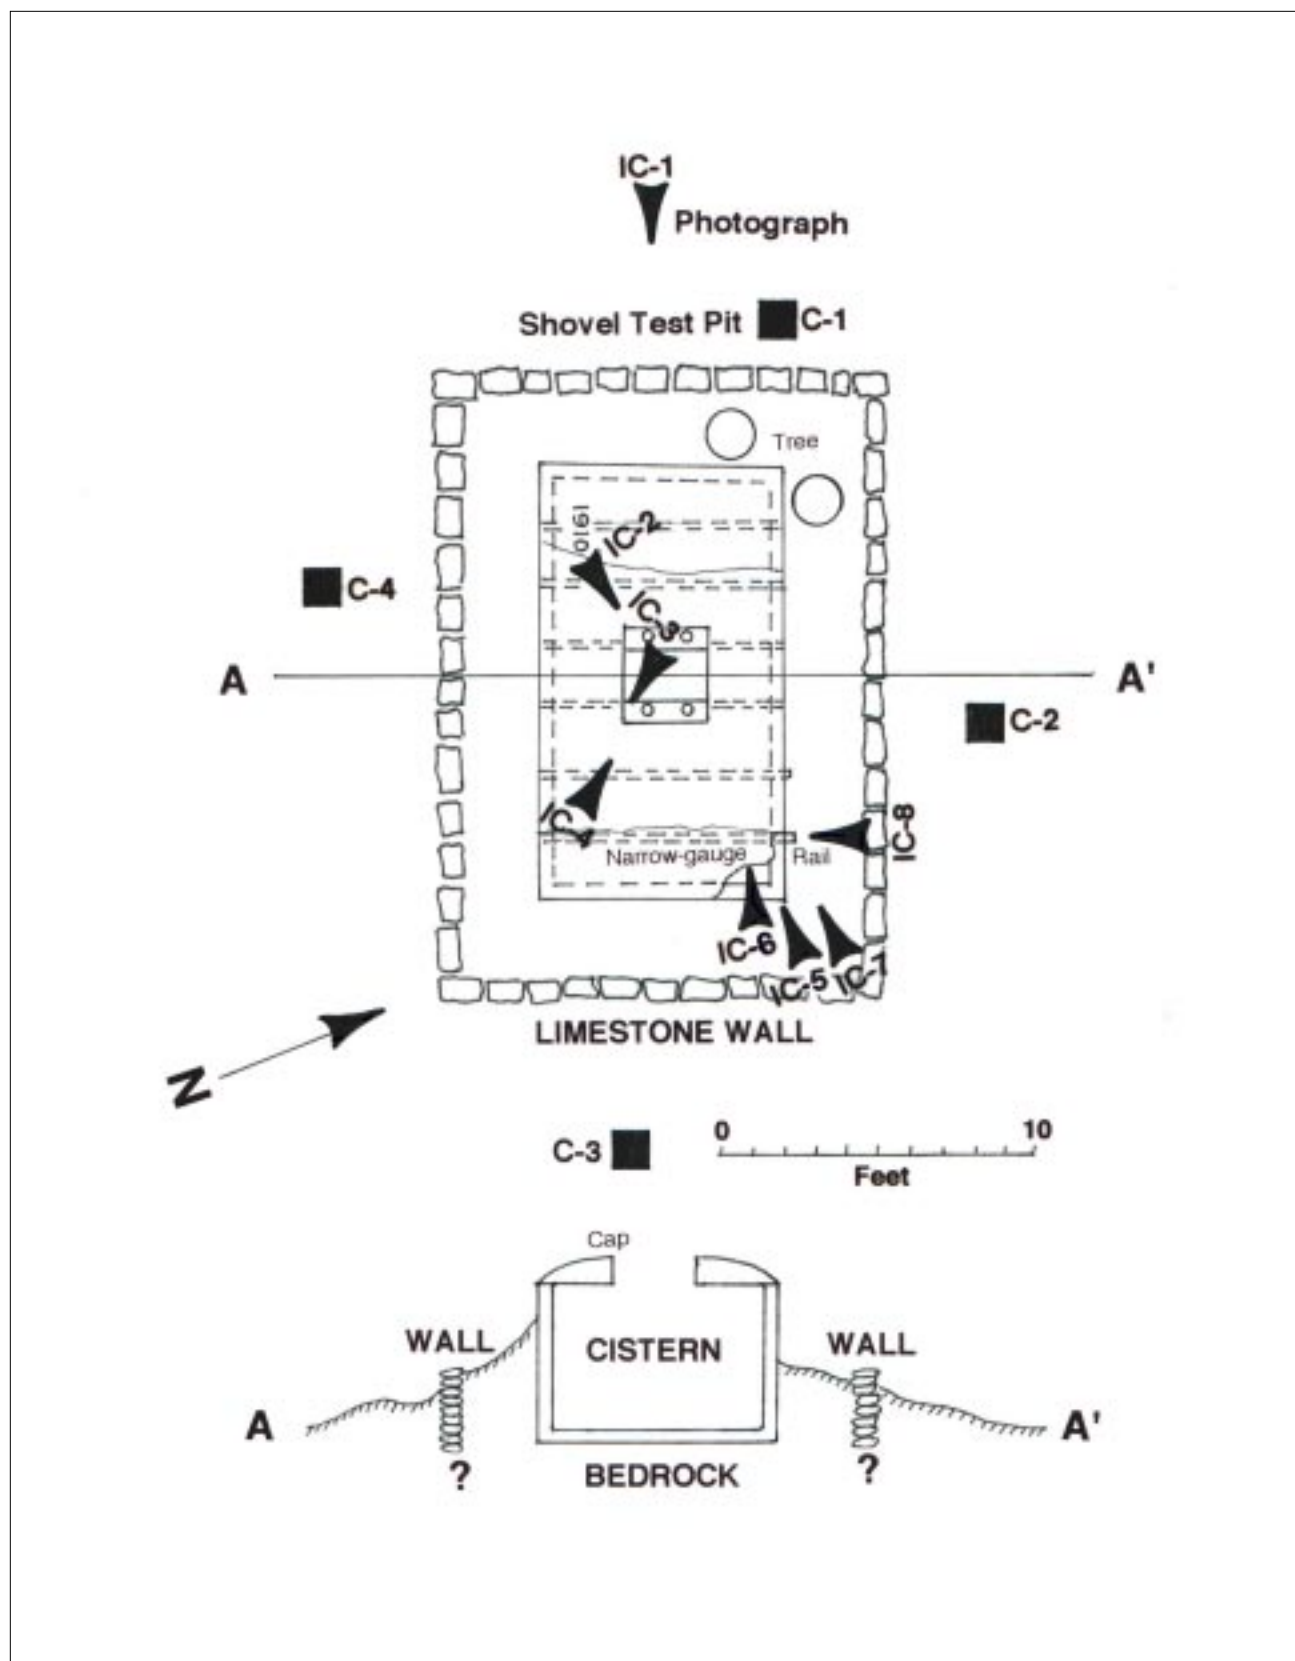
Site plan and cross-section of isolated cistern southwest of the Lincoln House foundation, showing location of shovel test pits and Appendix C photographs.
